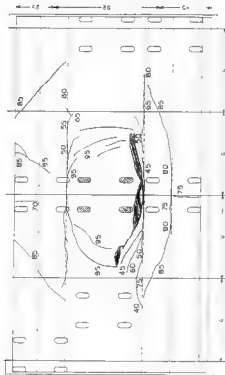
Top Cracking Pattern (Fifth Bridge - Test No 1)
